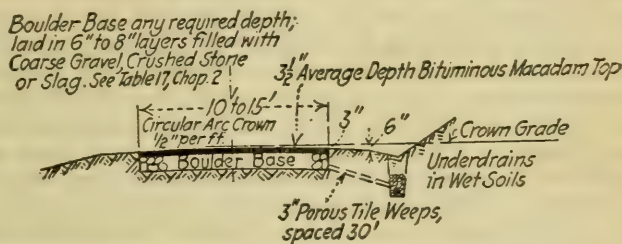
B.—Recommended penetration bituminous macadam pavement section, boulder base construction Class III or IV traffic.
